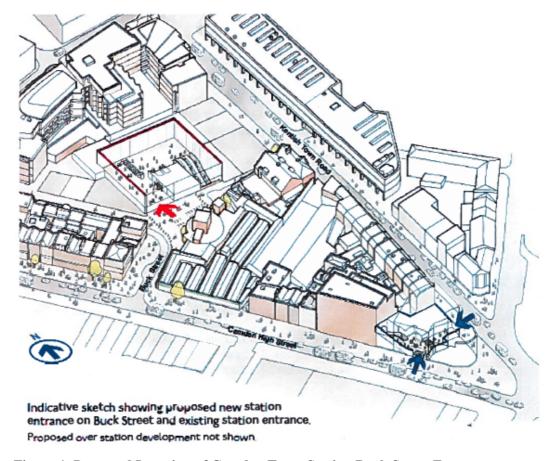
Proposed Location of Camden Town Station Buck Street Entrance
